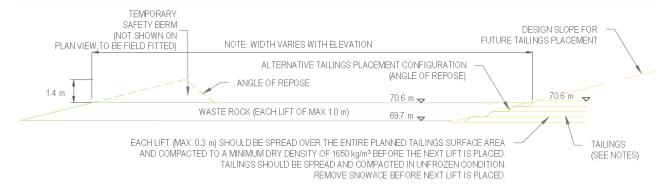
Typical Waste Rock Cover with Safety Berm and Tailings Detail
